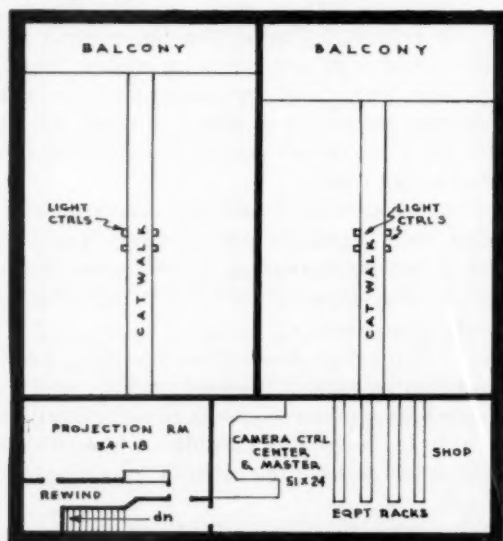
B. Floor plan of second floor showing projection and master control rooms and upper part of studios.
